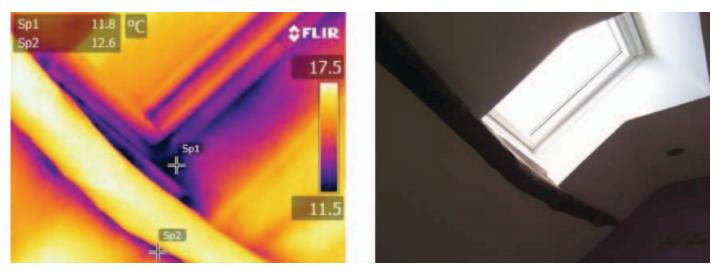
White House Farm, Stirton, Skipton D north facing ceiling in bathroom air ingress around roof light and beam.
